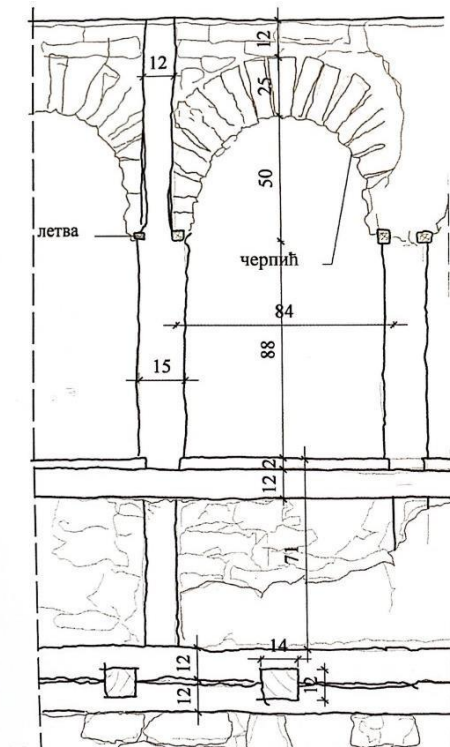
The construction technique for an arch on a Moravian house (Pešić Maksimović, 2014)
